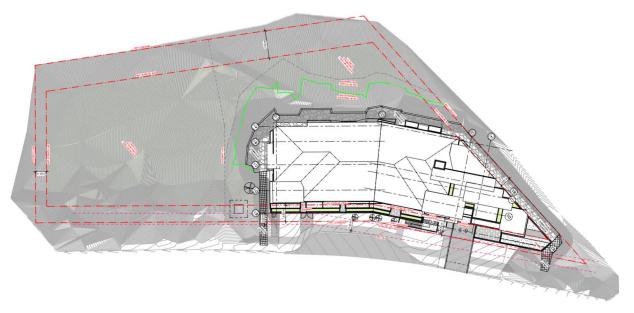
Site Plan showing development concentrated on the site to protect the remaining trees and native vegetation. An existing geotechnical covenant exists on the left (north) side of the property, and a further covenant will be required on the remainder of the site not proposed to be developed. Changes to the grade are located behind the proposed building and any grading requirements (rock cuts, retaining walls etc.) will be located within the property boundaries.
